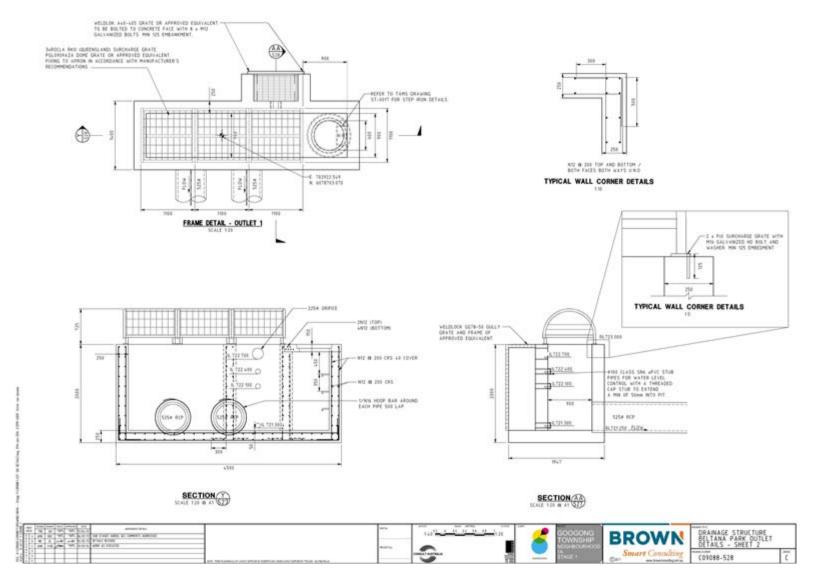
Design drawings - Drainage structure Beltana Park outlet (Sheet 2)
